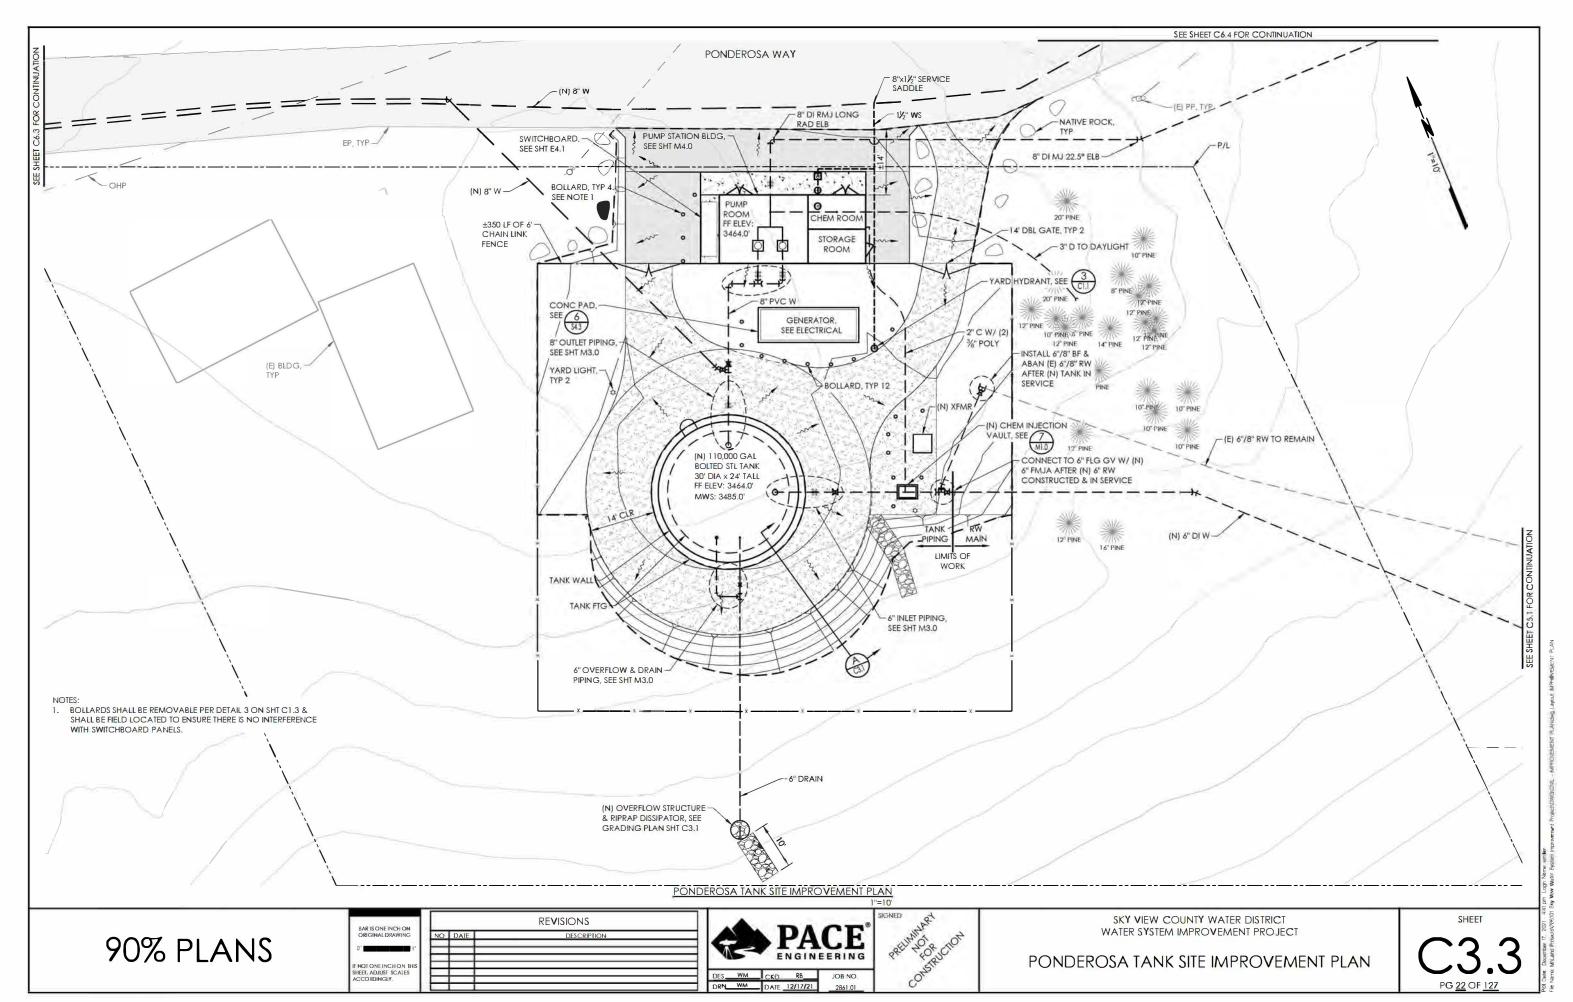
Ponderosa Way Tank Site - Proposed Improvements
